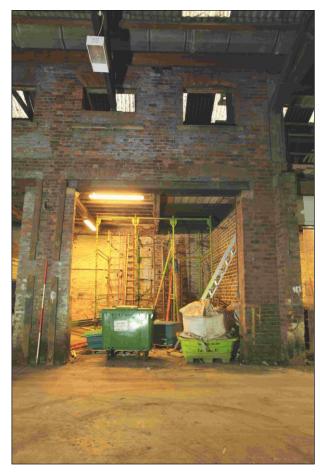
Detail of a typical bay of the former west elevation of the central range with G17 beyond Film 2.33)
